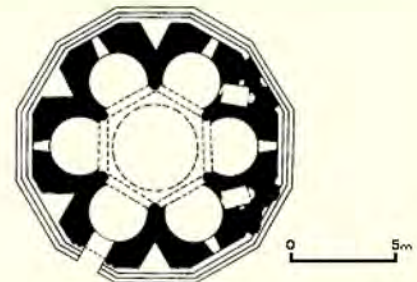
Abughamrents St. Gregory Church. Floor plan.
